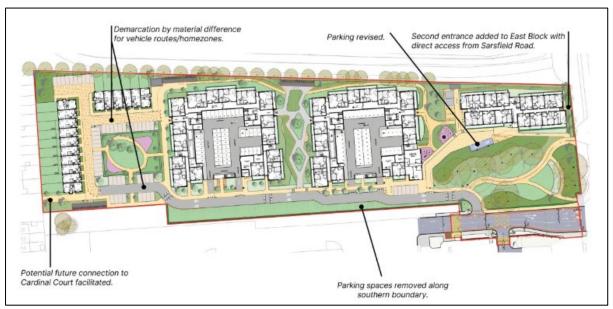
Current Site Layout. The image outlines the proposed development's access points, layout, and permeability. [Source: Reddy Architecture + Urbanism, cropped and annotated by TPA 2025]
